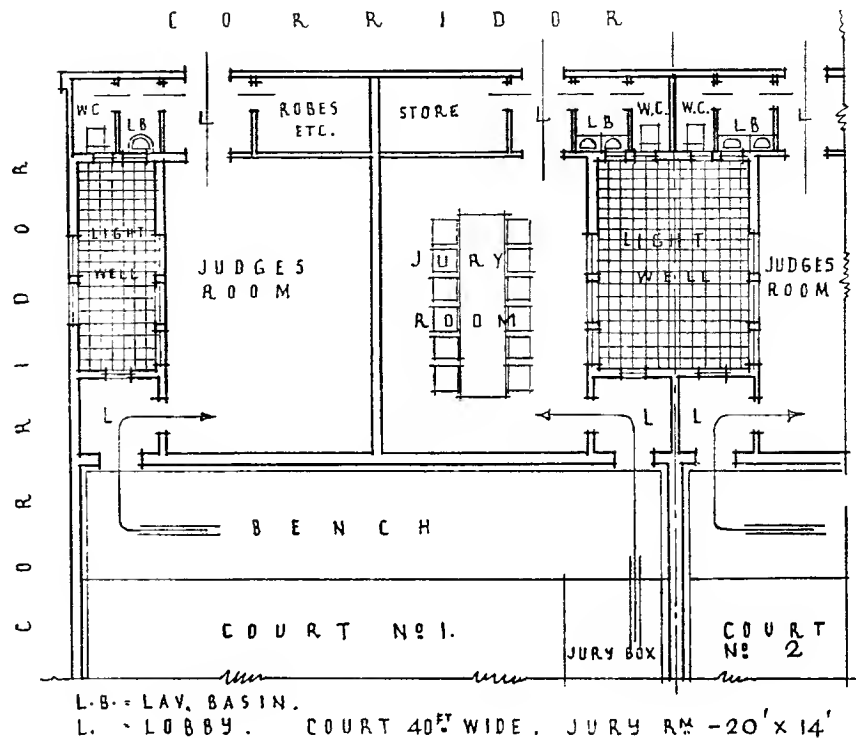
Assize Courts: typical layout for judges' and jury rooms
